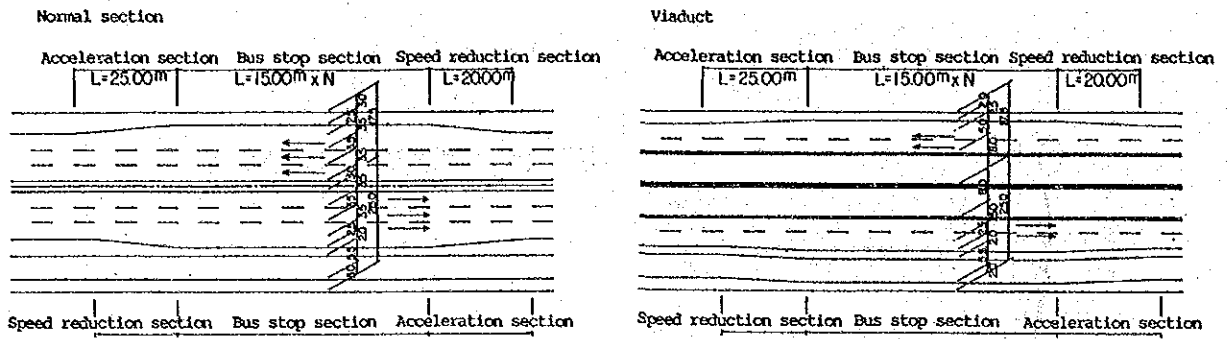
TYPICAL PLAN OF BUS STOP
